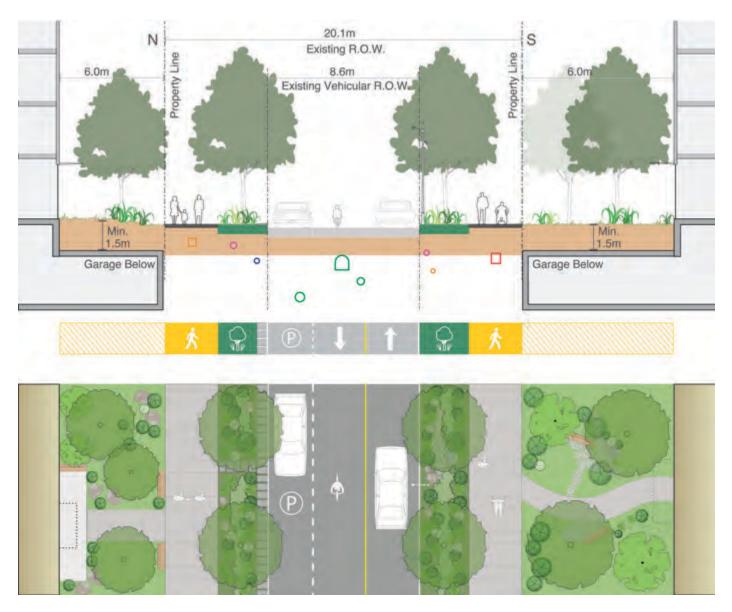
Section and Plan of Balliol Green Street - Recommended Final Condition
